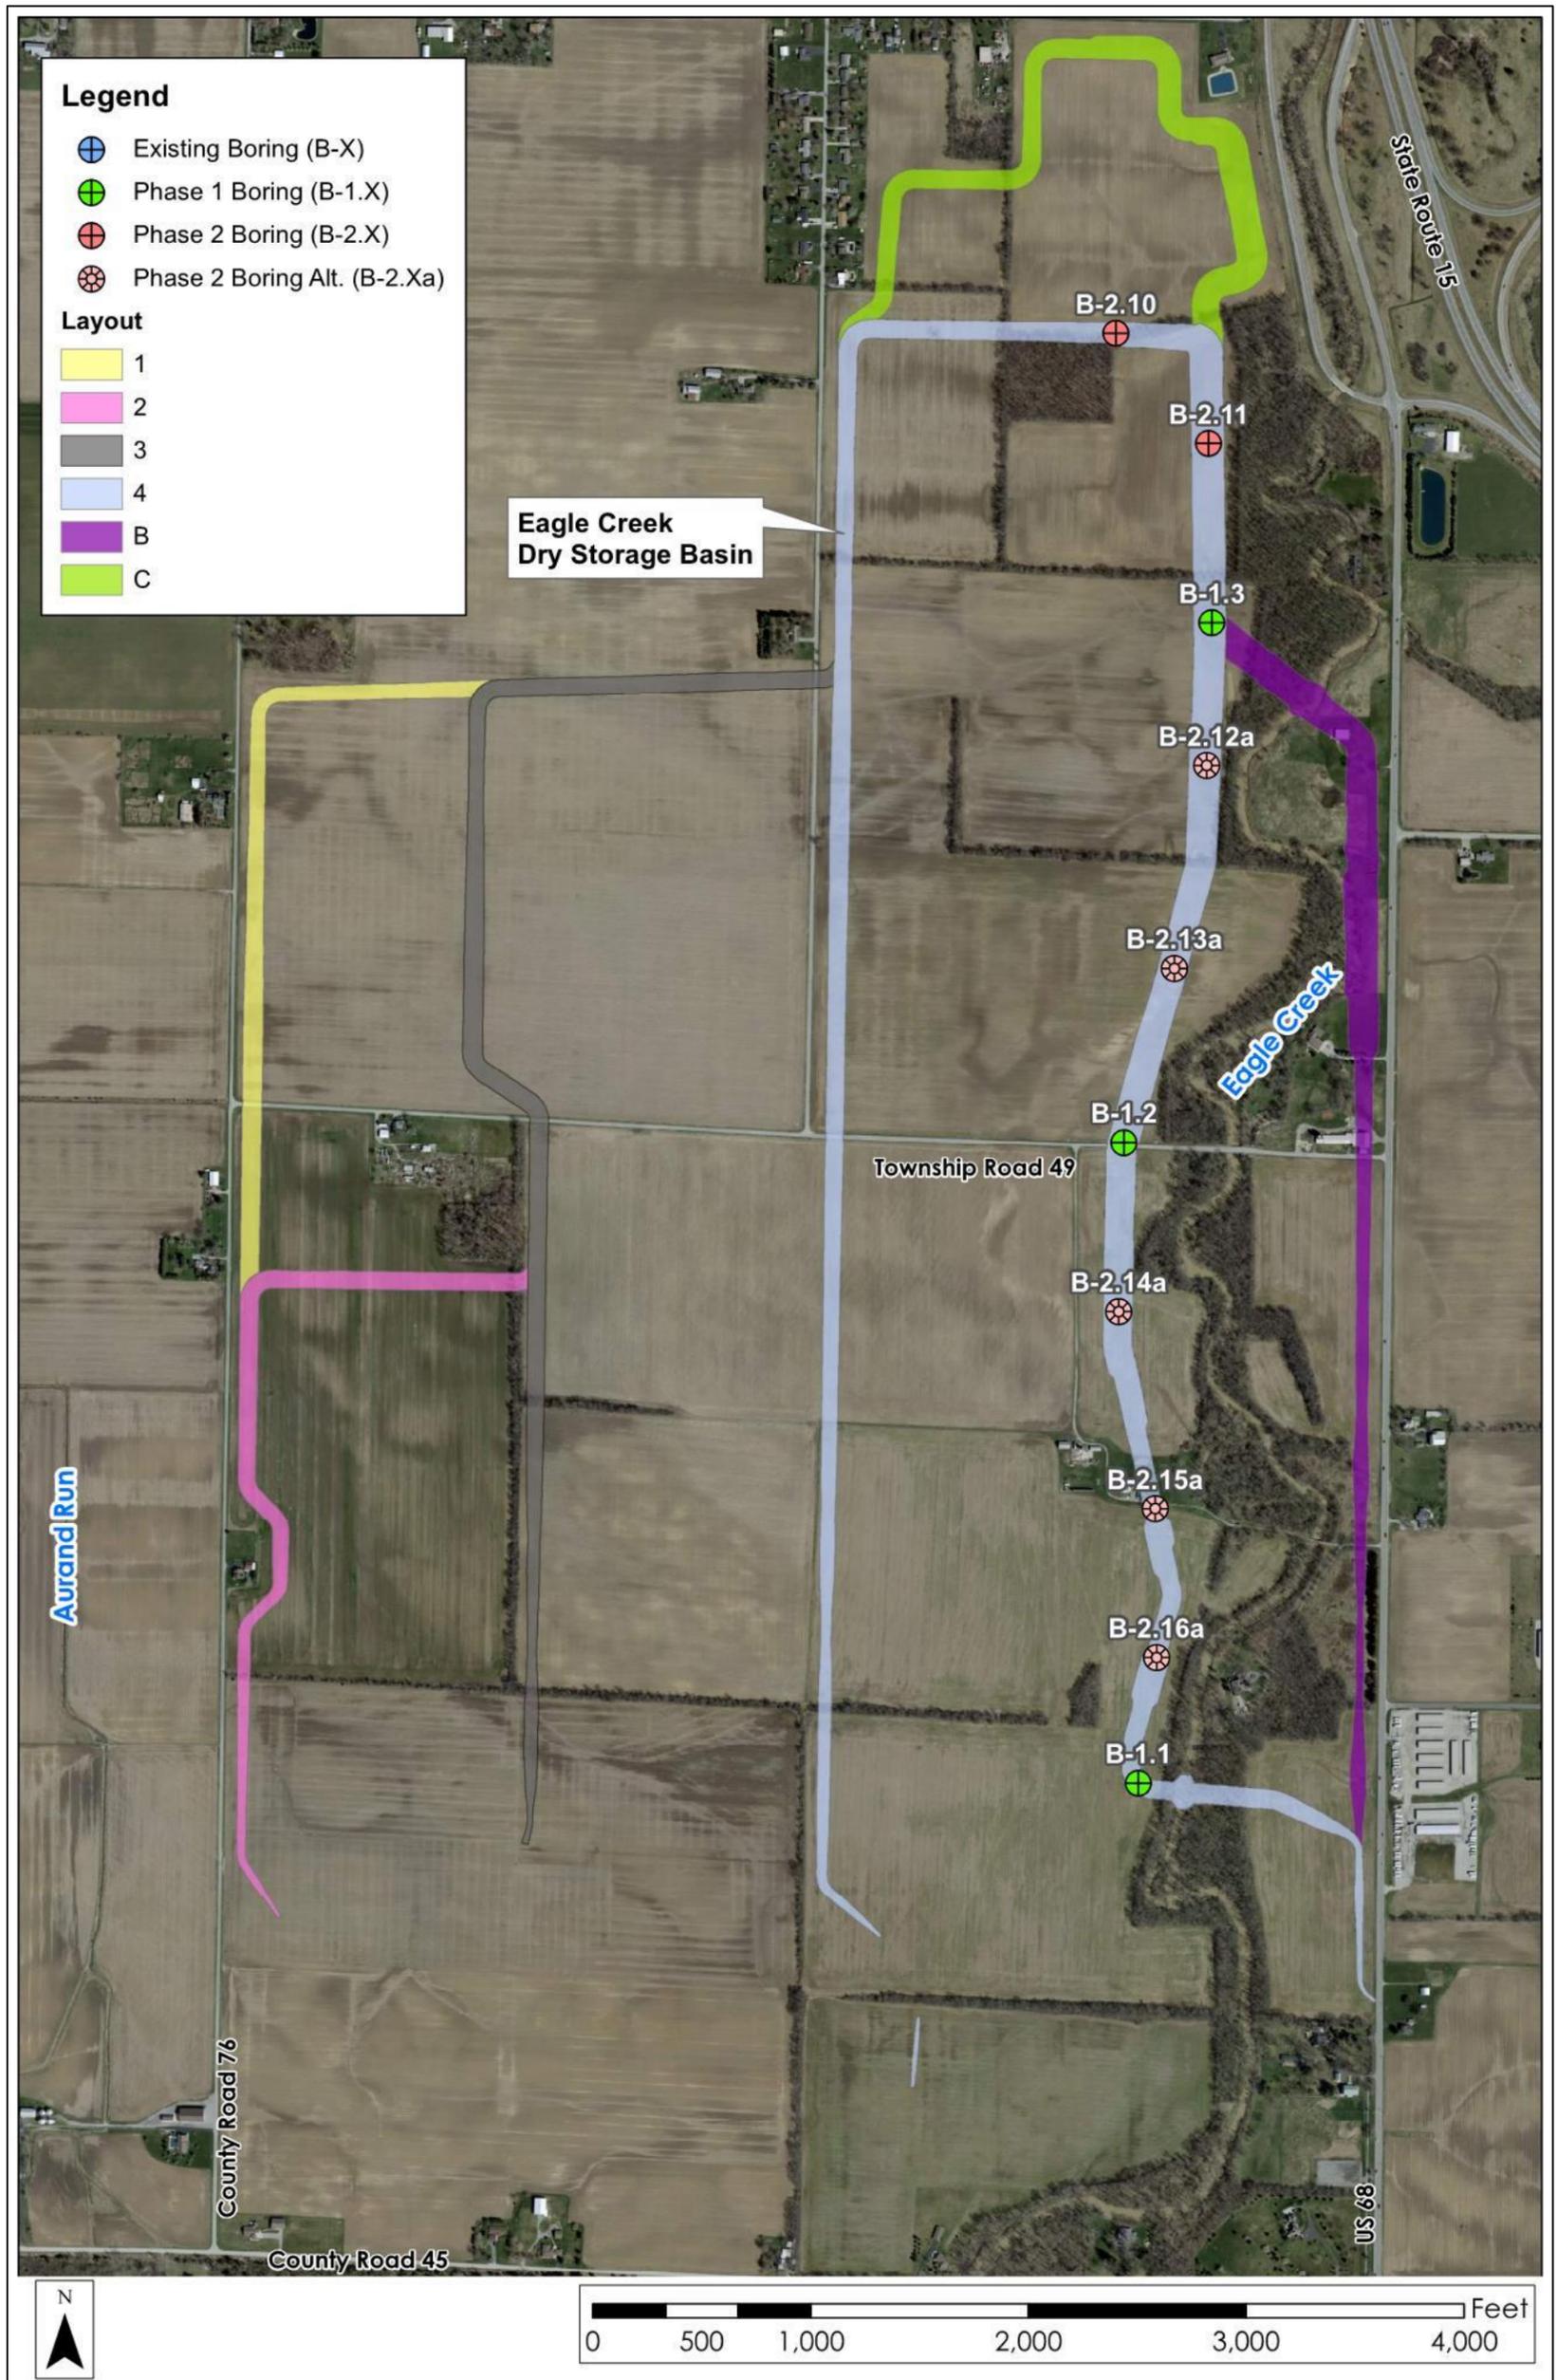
Eagle Creek Dry-Storage Basin – Geotechnical Boring Layout
